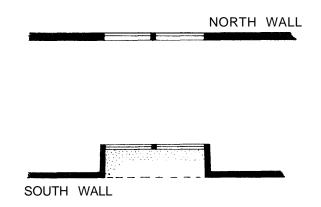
GLASS SHADING, SOUTH ELEVATION
